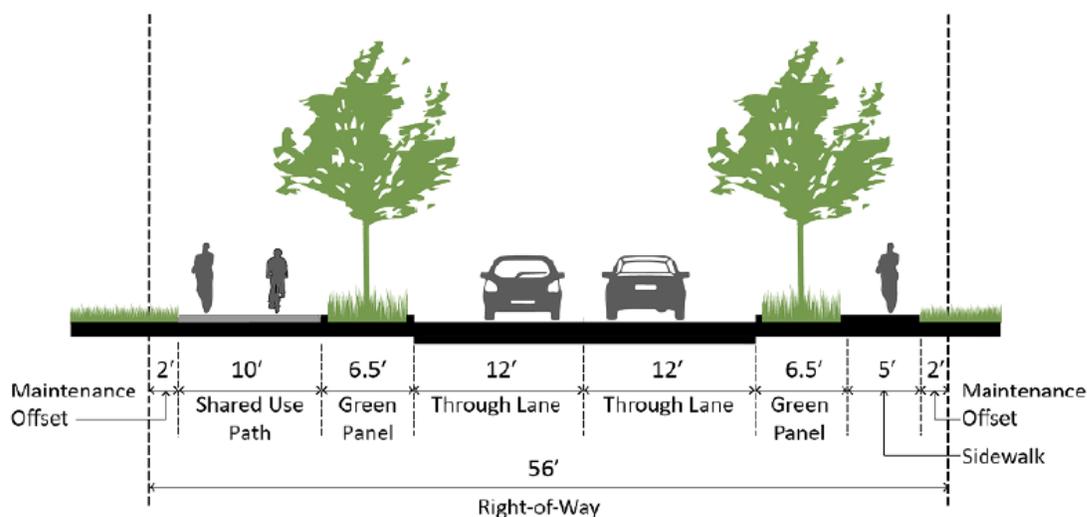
Stewarttown Road Extension Cross-Section (2-lane section West of Montgomery Village Avenue, looking West)
